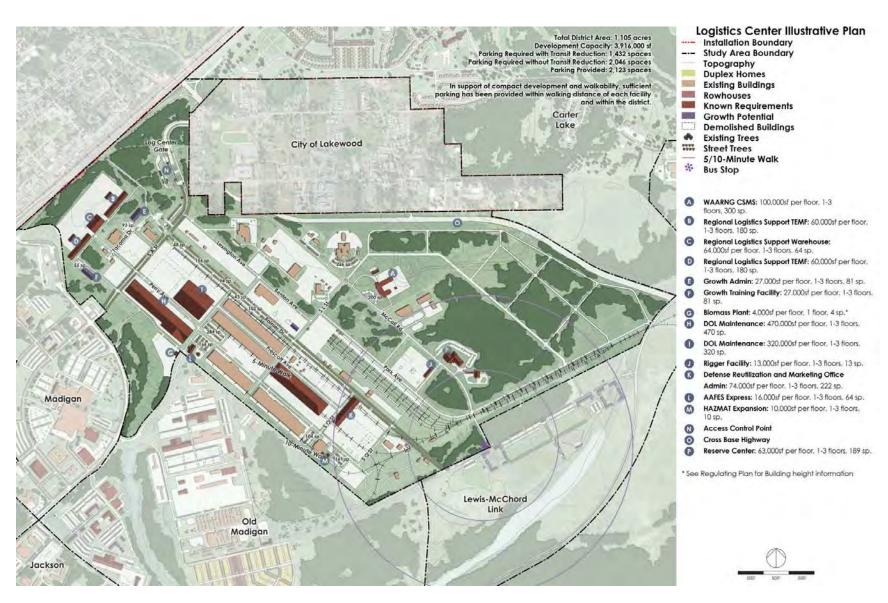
Logistics Center Area Development Plan Illustrative Plan
